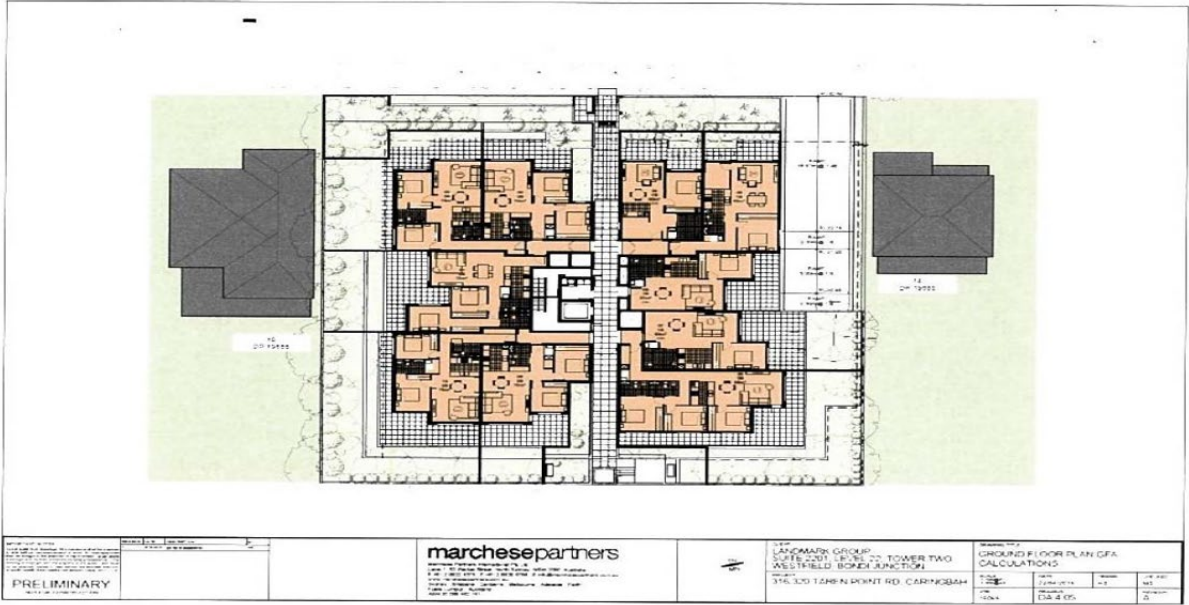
Applicant's calculation of gross floor area identified in brown tone
